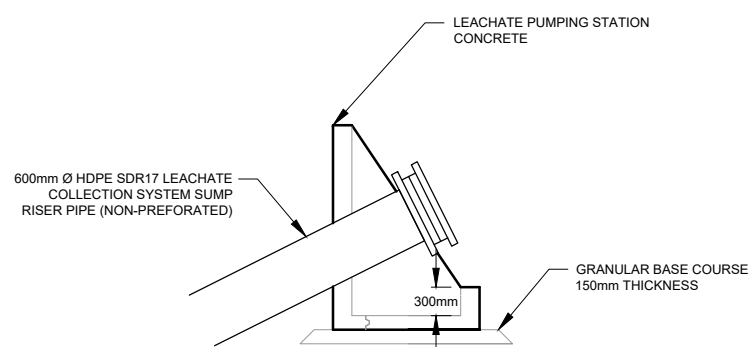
LEACHATE COLLECTION SYSTEM TOE DRAIN/ LEACHATE COLLECTION SYSTEM PIPE
